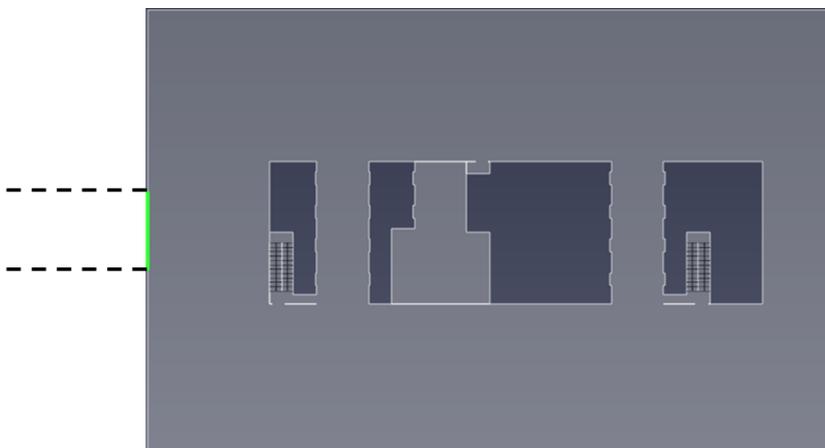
Schematic representation of floor 18, the refuge floor (1) between low-rise zone and mid-rise zone of the building. At this floor, sky-bridge 1 is located (dotted lines).
